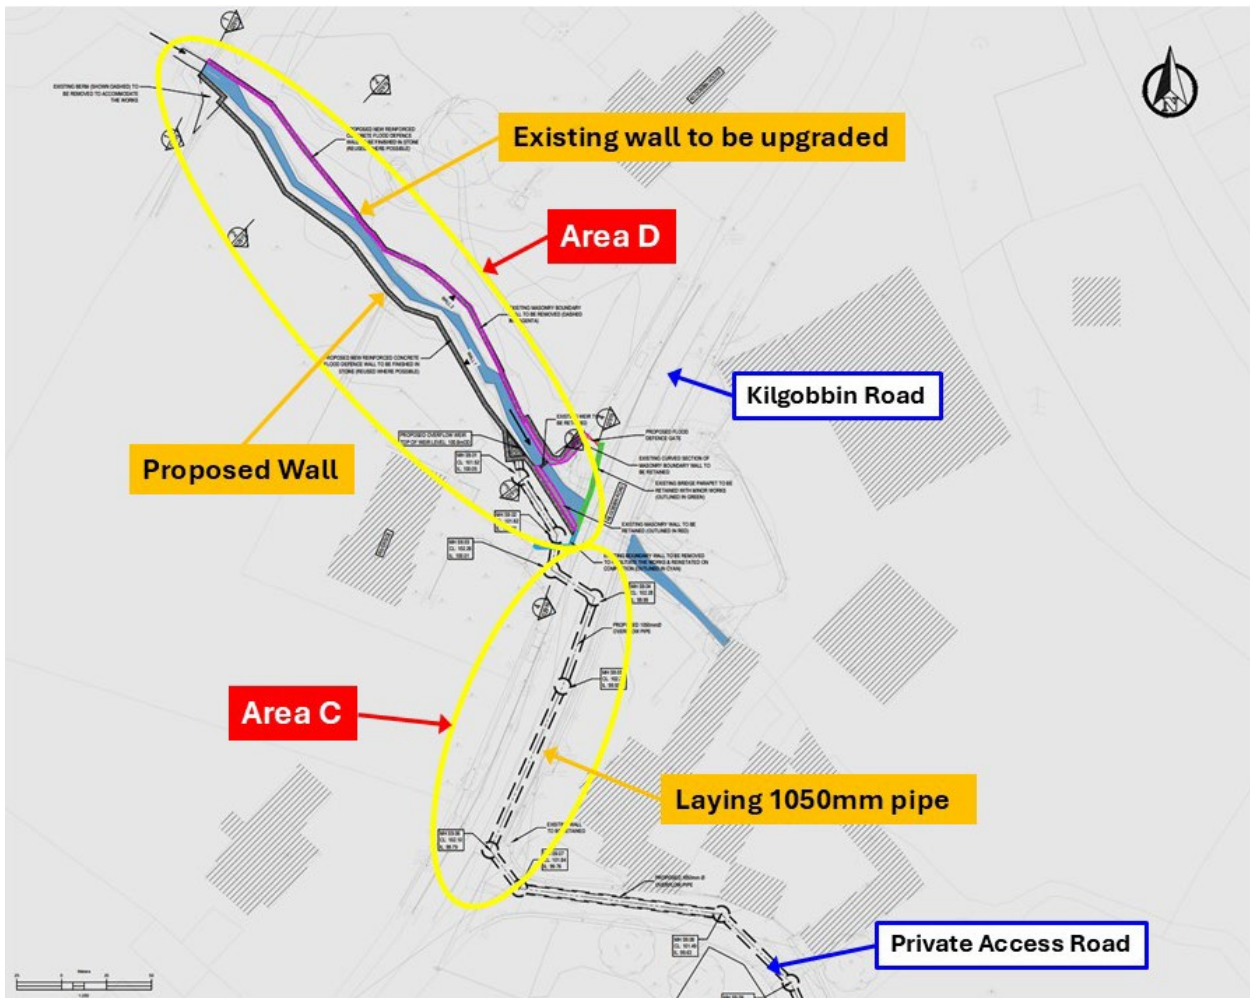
Section of Proposed Works at Kilgobbin Site (Part 2 of 2)
